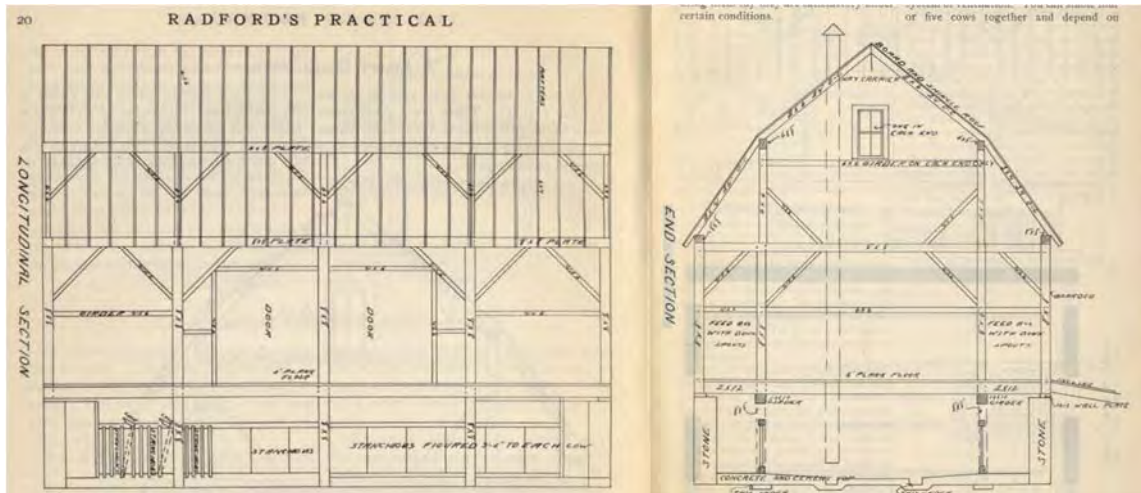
Composite of longitudinal and end sections for 'Dairy Bank Barn-A125' from Radford's Practical Barn Plans 1907 catalogue (Radford's Practical Barn Plans).
